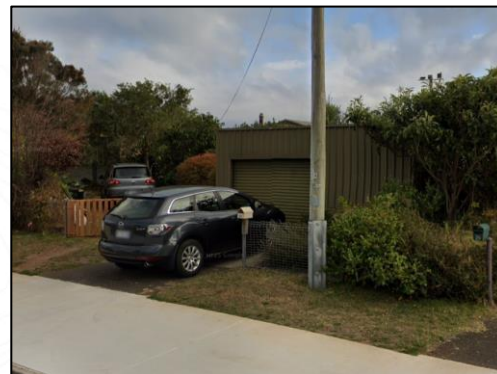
Susan Street – approx. setback 3.5m – Note vehicle overhang into Road Reserve
